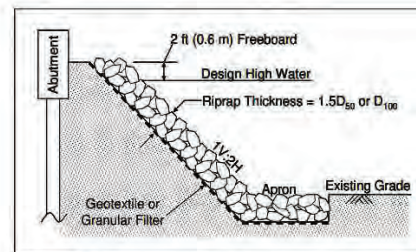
Typical cross section for abutment riprap (Lagasse et al. 2006).
